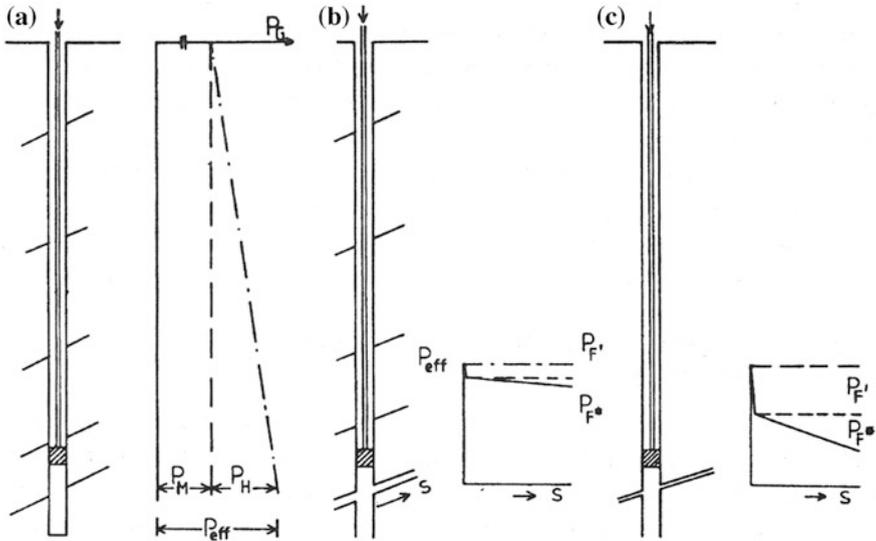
Relationship between state of discontinuities and grouting pressures: a Joints intersecting the groutholes stage are closed. b Wide fissures intersect the grouthole stage. c Narrow fissures intersect the grouthole stage. P_M —Pressure at the top of the hole. P_H —Static head caused by suspension. P_{eff} —Effective grouting pressure. P_F —Head losses due to friction at the entrance of the fissure (s). P_{F^*} —Head losses due to friction at the entrance of the fissure(s)
